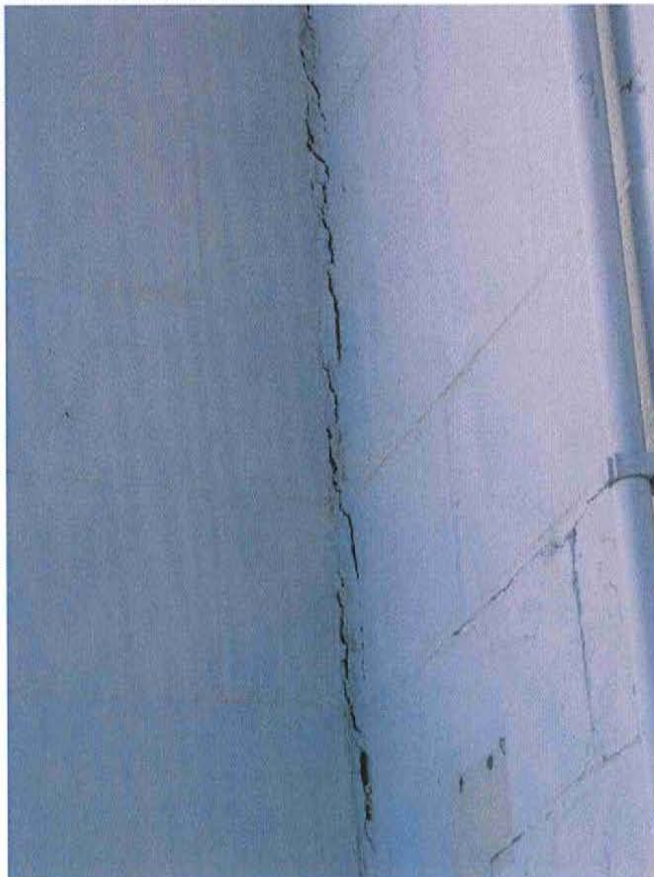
Control Building - View of vertical joint where south wall of grit room addition joins the west wall of the control building. Note separation of the "hard" (mortar) joint.
